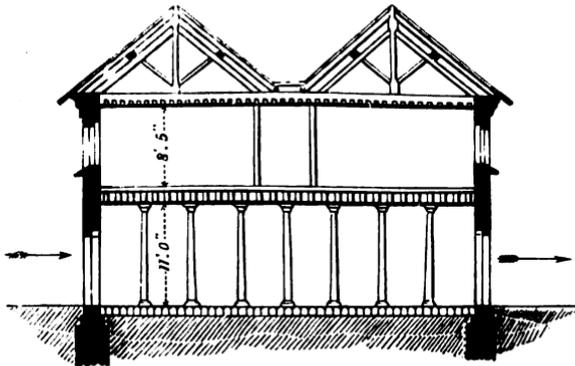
Transverse section of stable. Eight horses are placed between opposite windows, with their heads to dividing walls. The arrows indicate the direction of the wind.
